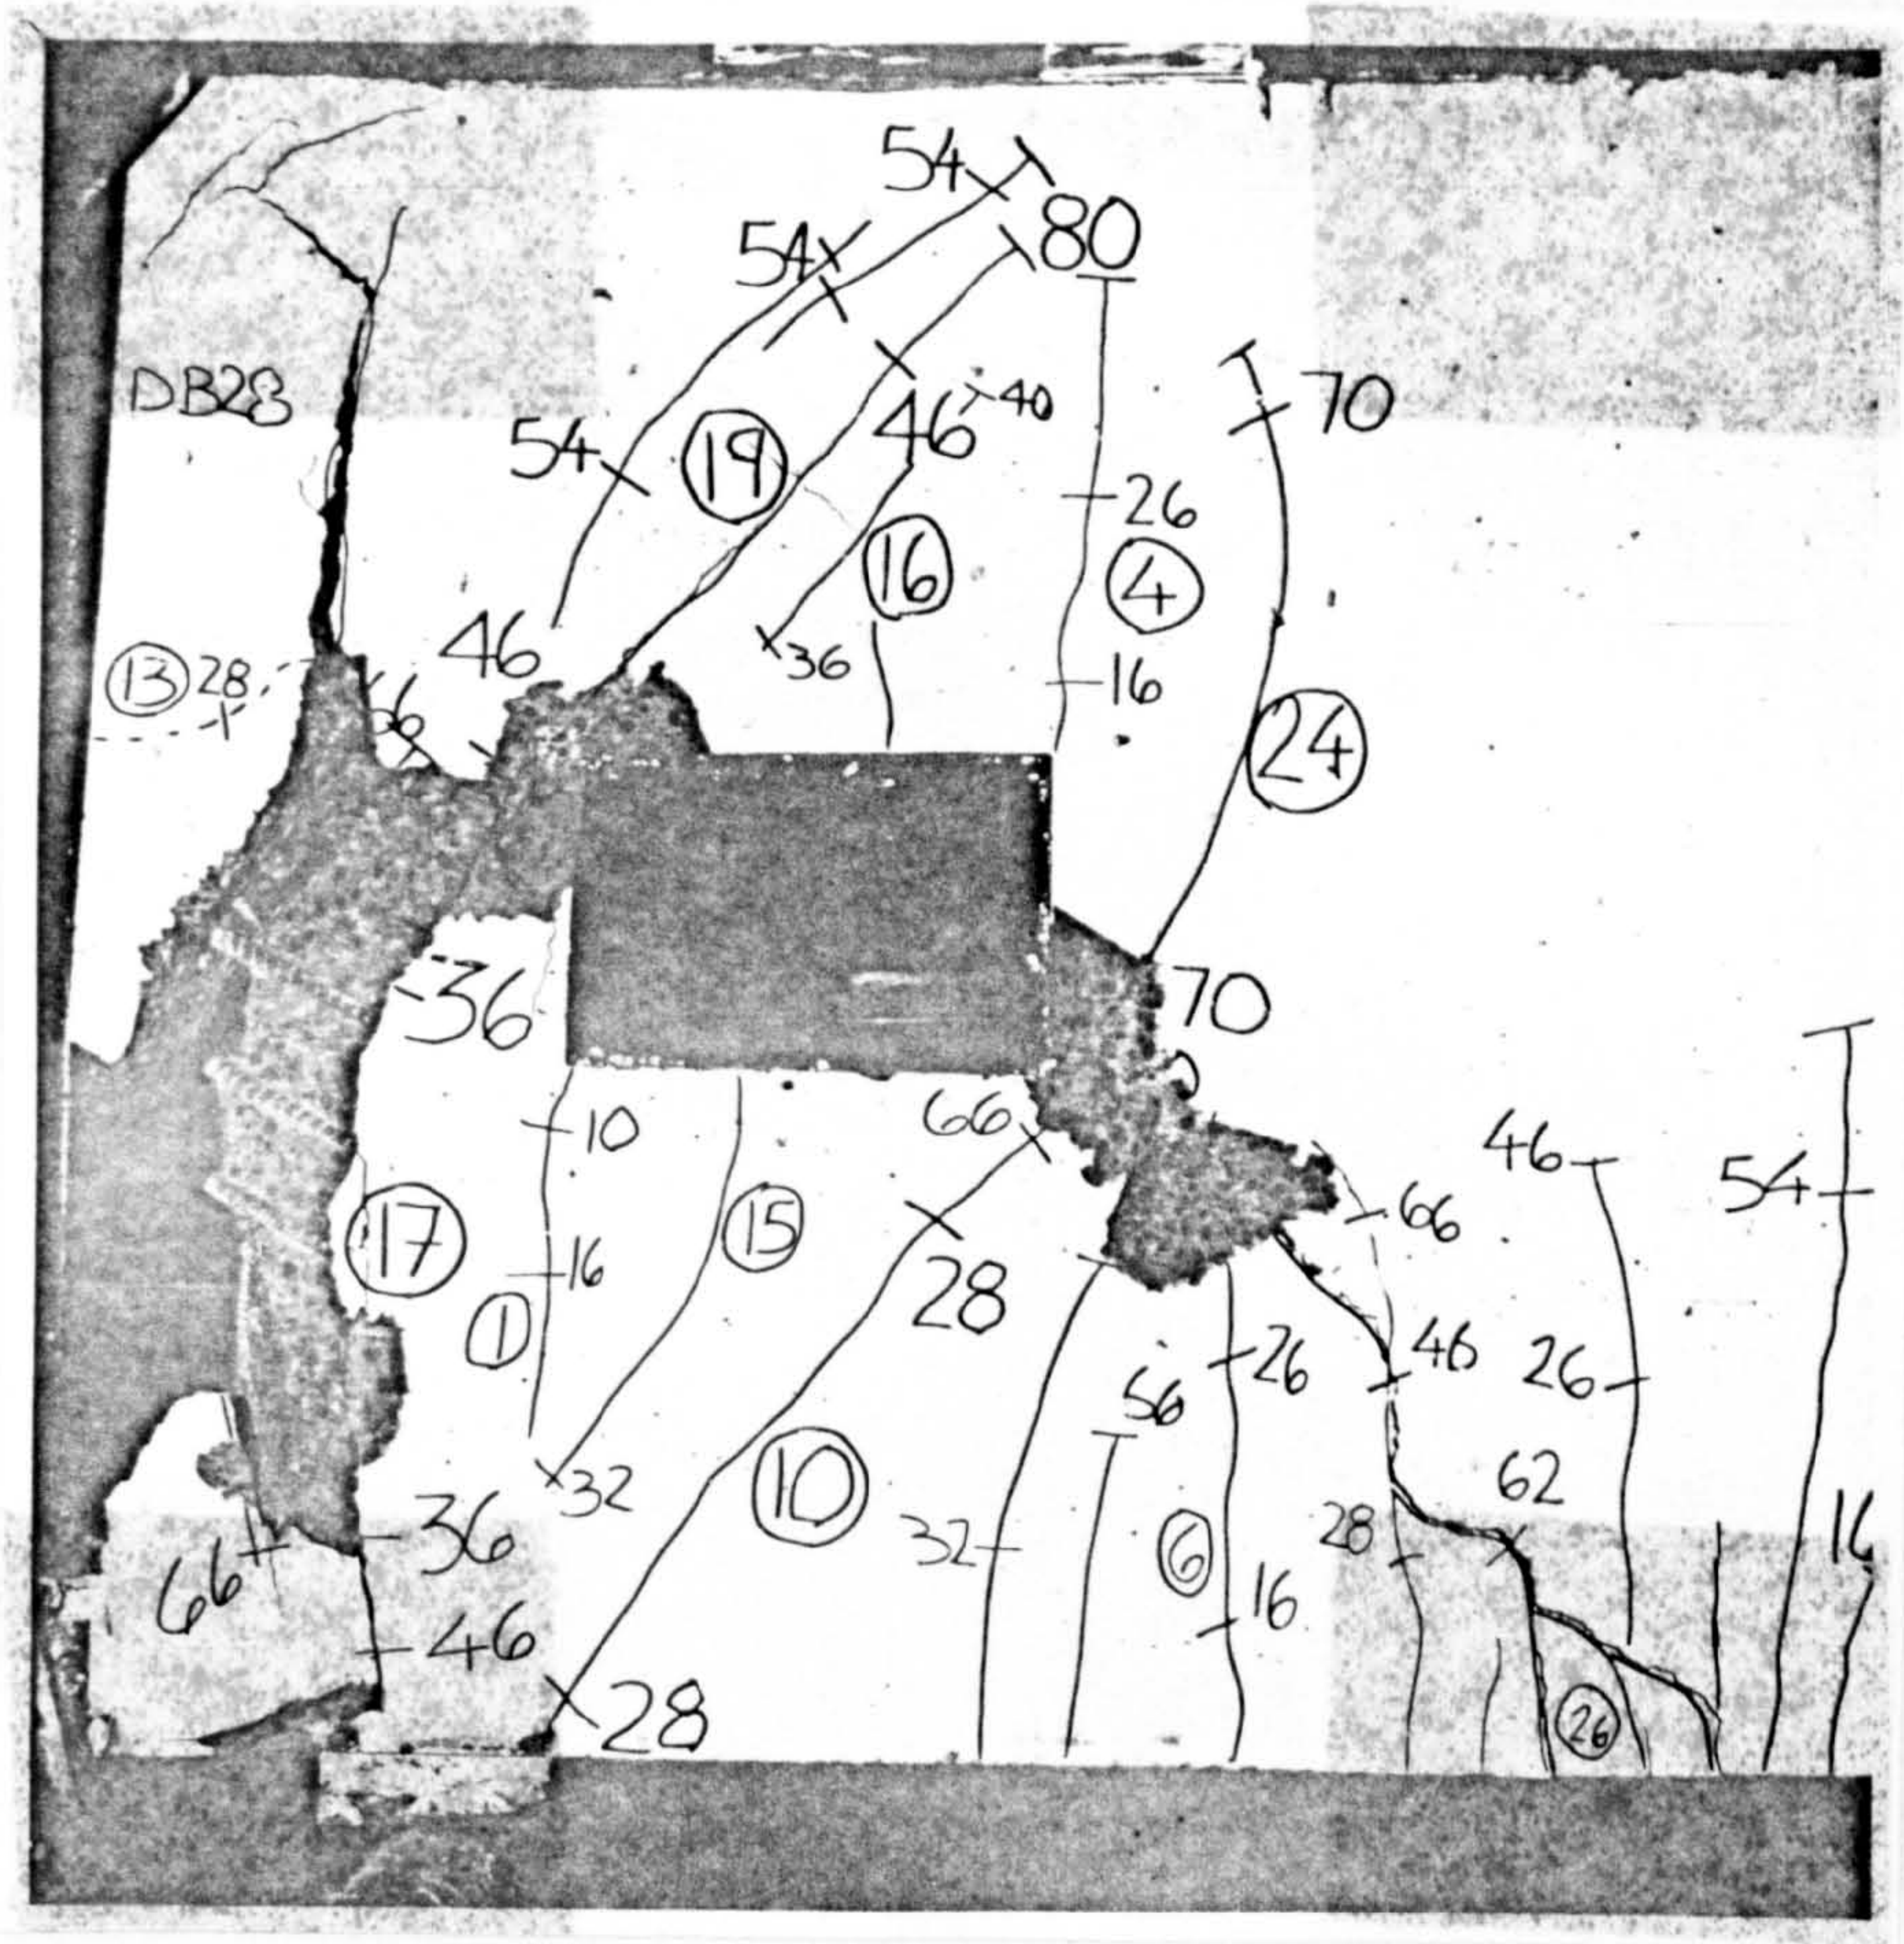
BEAM W6-0.3/4 AFTER FAILURE
